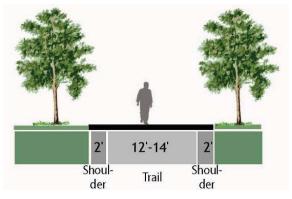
Section 1.2a Trail Only in Willamette Shore Line
